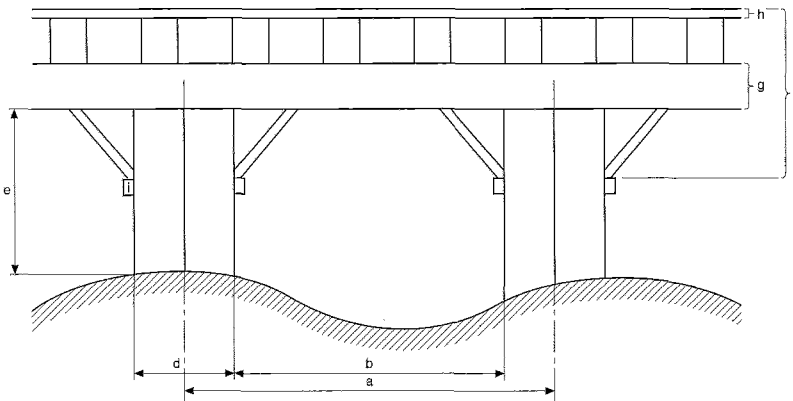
Explanation of terms and concepts in bridge building. Legend: a span; b clear span; c length of pier; d width of pier; e height of pier; f superstructure; g bridge girders; h road surface; i corbels; j cutwater; k rear.
